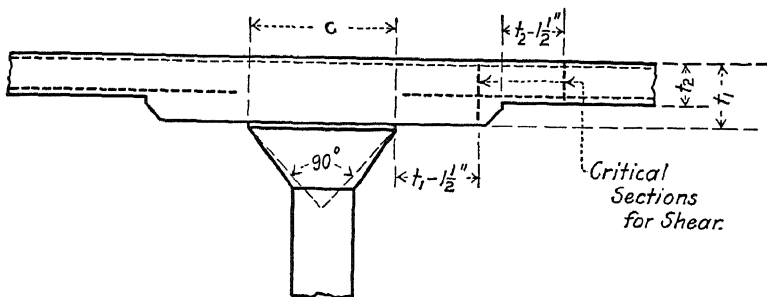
Typical Column Capital and Sections of Flat Slab with Dropped Panel.
